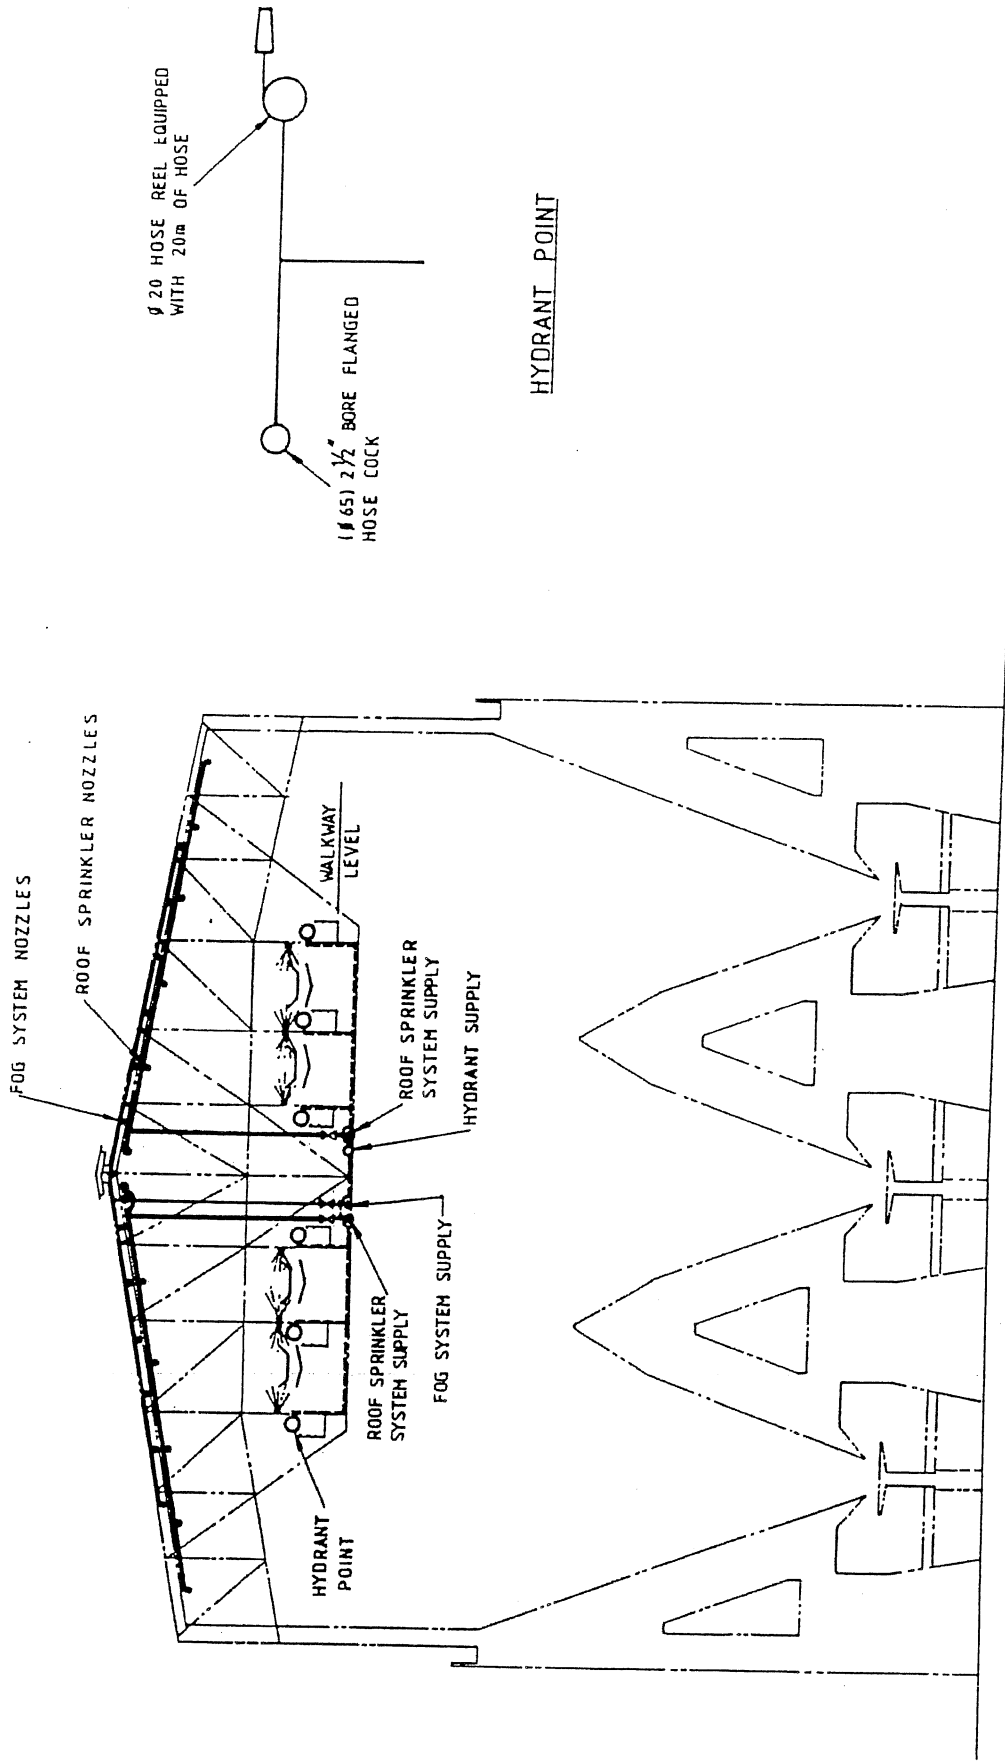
TYPICAL CROSS SECTION OF BUNKER SHOWING REQUIRED PROTECTION
